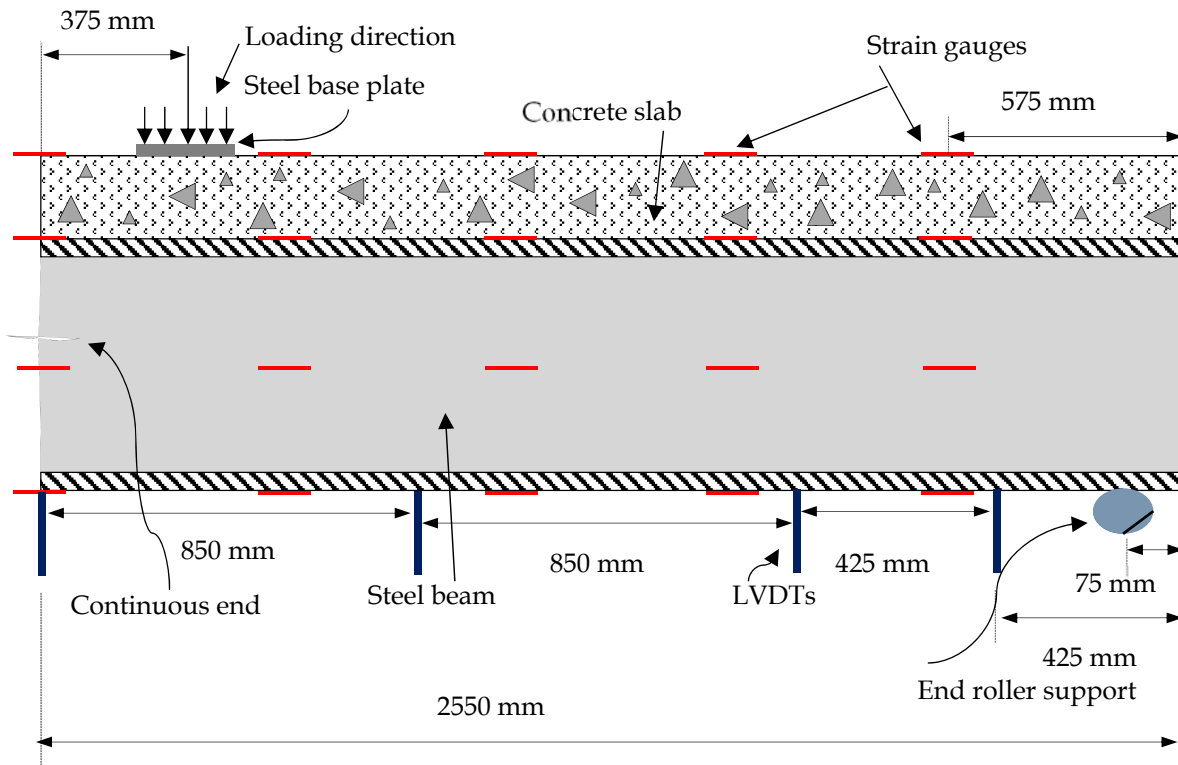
Side view of steel-concrete composite beam (half span)
